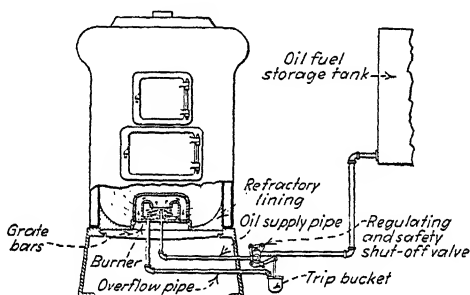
Simple step-cone oil burner with auxiliary equipment.
